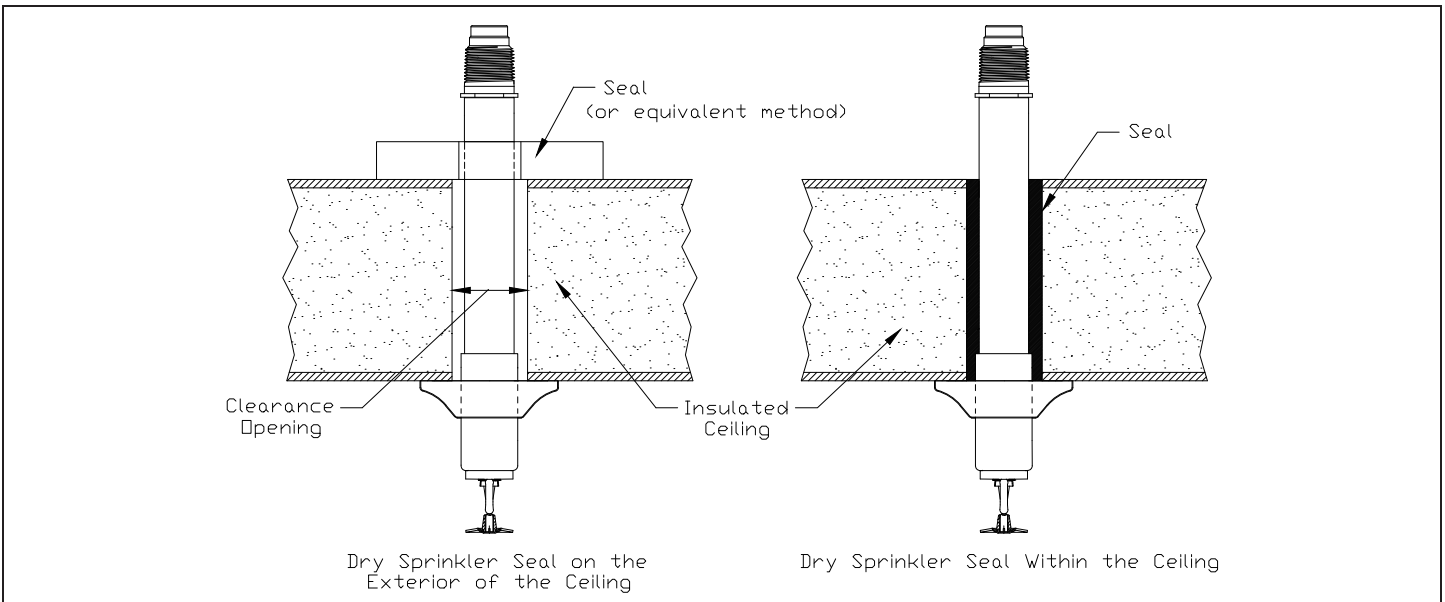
Dry Sprinkler Seal (Adjustable Standard Dry Pendent Sprinkler is Shown)
